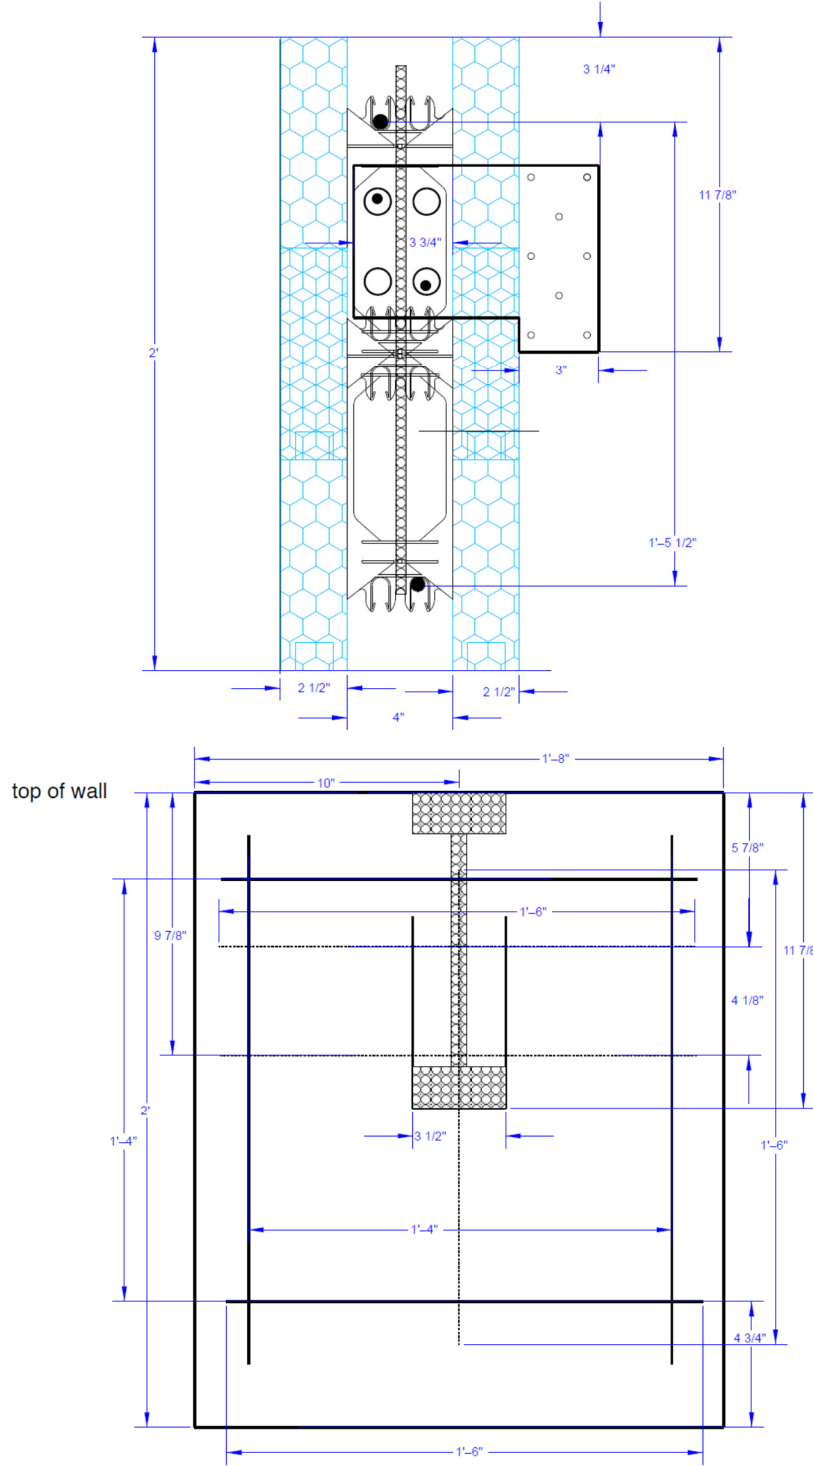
Tested specimen dimensions (drawing by RP Watkins).
